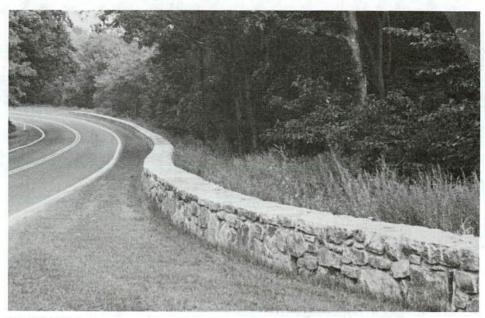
Stone masonry guardwall—Skyline Drive, Virginia.
